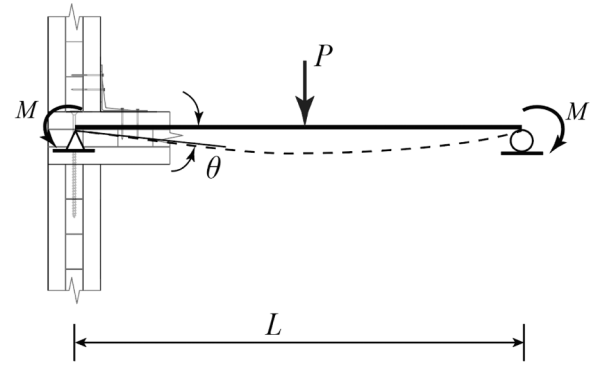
Schematic diagram of mass timber floors with end support restraints.
